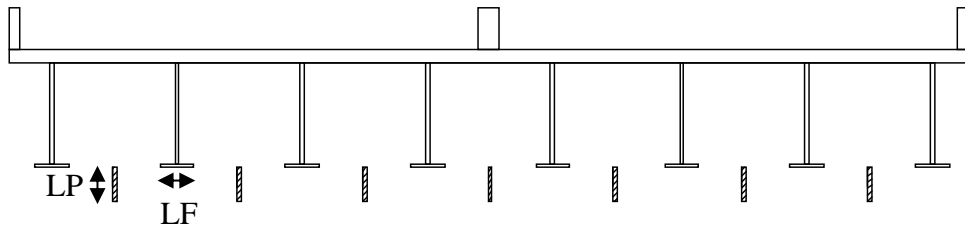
Illustration of vertical plates installed between the bridge girders (Case V4)
